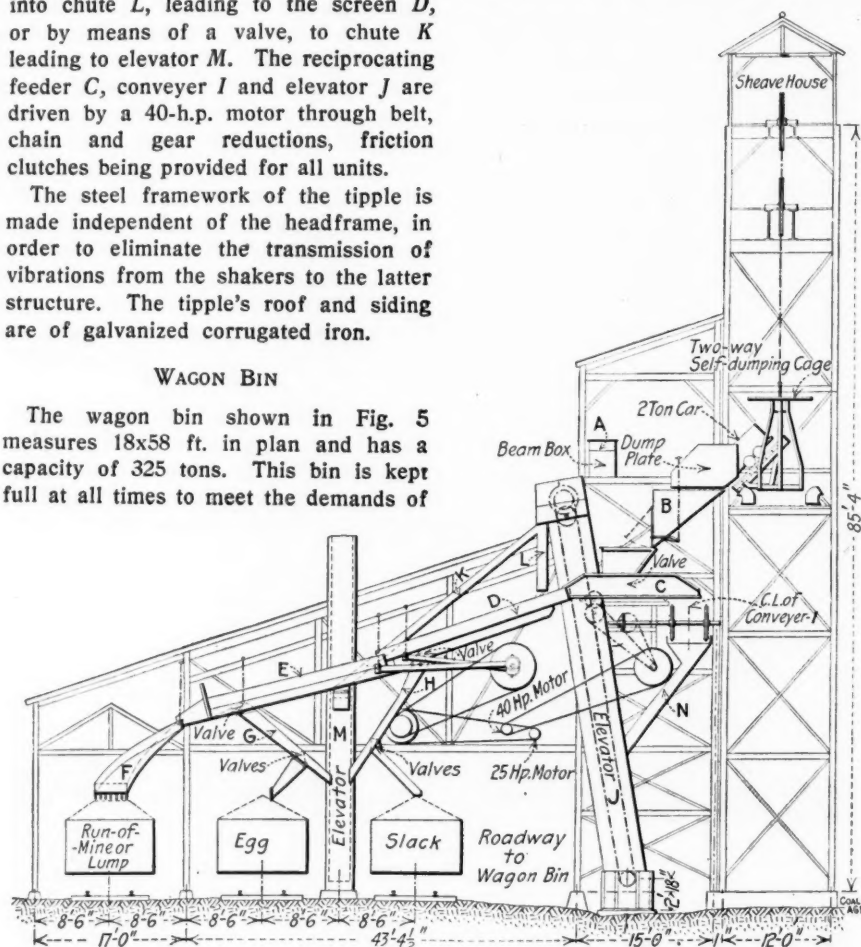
LONGITUDINAL ELEVATION OF TIPPLE
